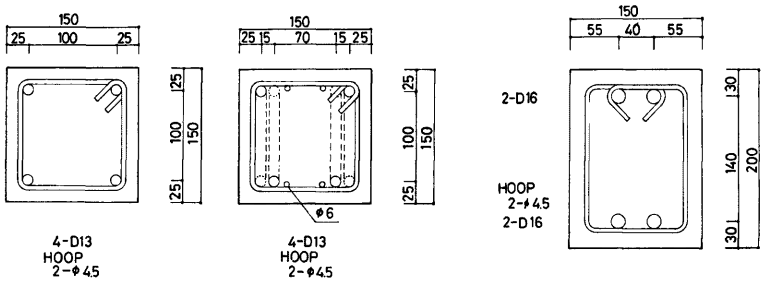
Nominal Dimensions and Reinforcement Cage of Test Specimen (unit : mm)
